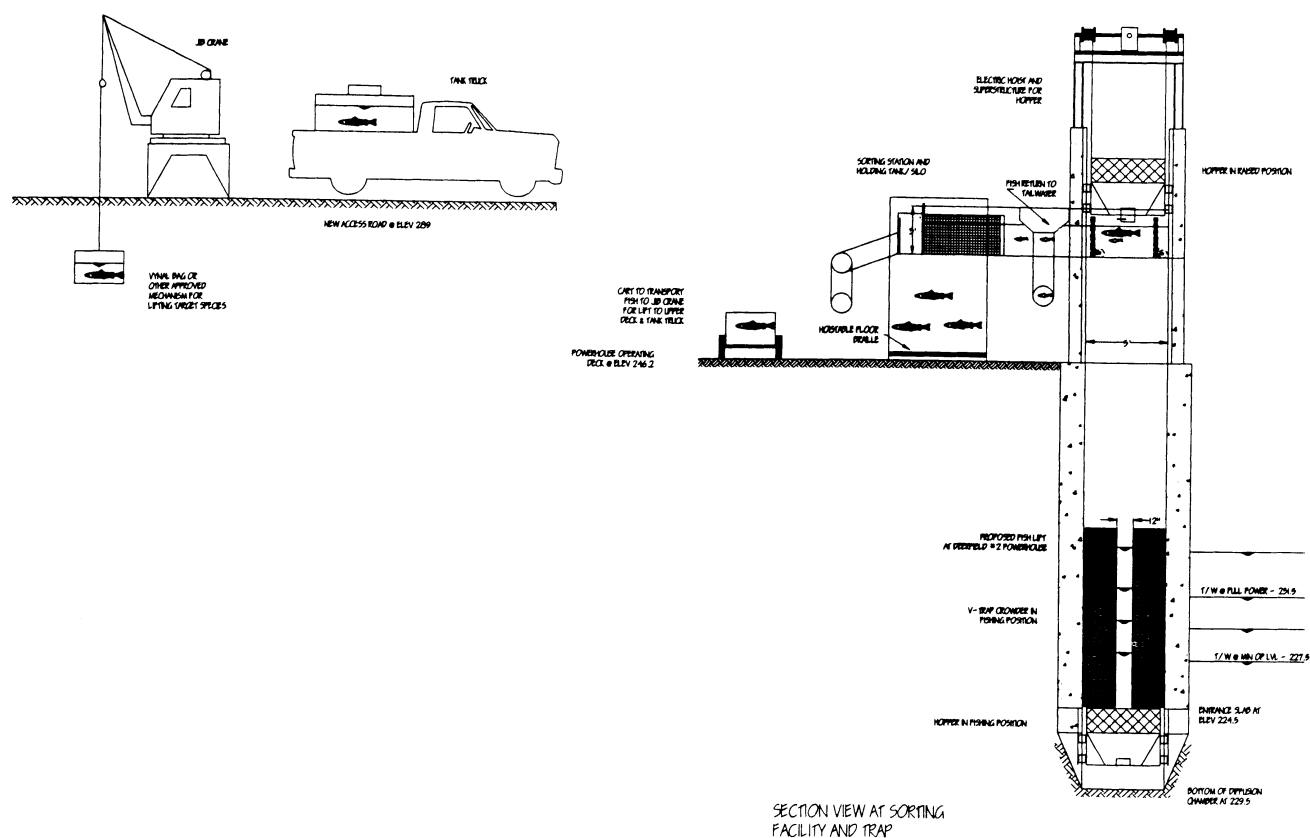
Plan view of trapping and sorting facility for a typical fish lift and fish lock.
